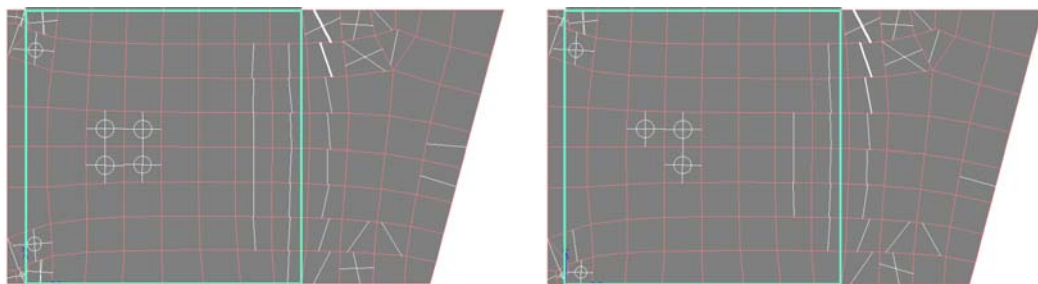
Test concrete beam, 8C-IIC – 1130 kN (left: no reinforcement, right: with reinforcement)
